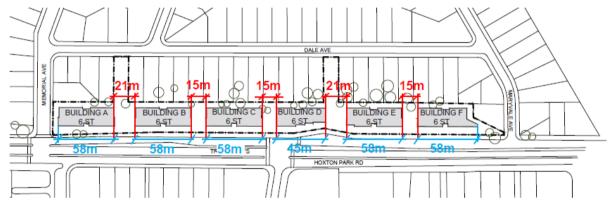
Overview of site layout including building separation and building width. Source: Architectural plans by Tony Owen Partners
